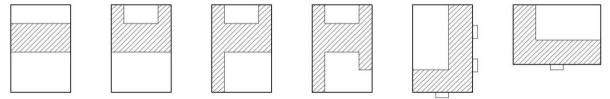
Plan structure diagram in the late Qajar and Pahlavi houses in Rasht. Source: Authors.
